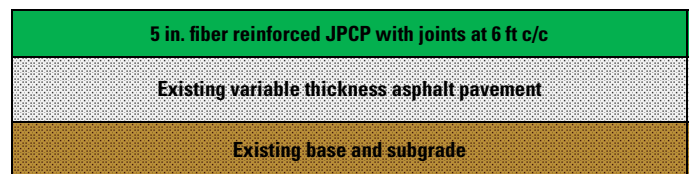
through 20 show photos of the project, and Figure 21 shows a typical section of the overlay.
